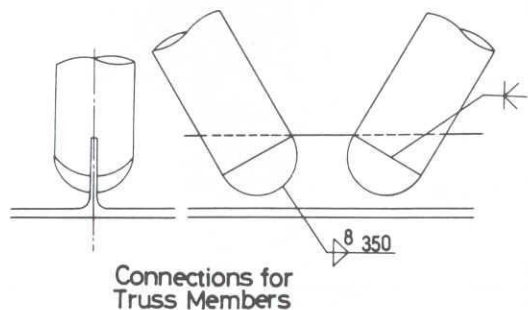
Details of Main Truss and Connection of G-High School Gymnasium
